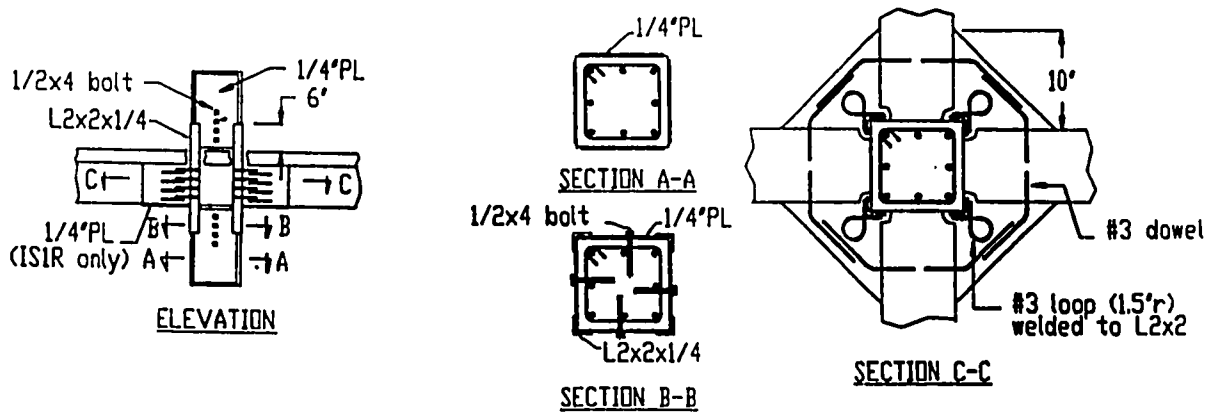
Details of external steel reinforcement (Corazao and Durrani, 1989)
